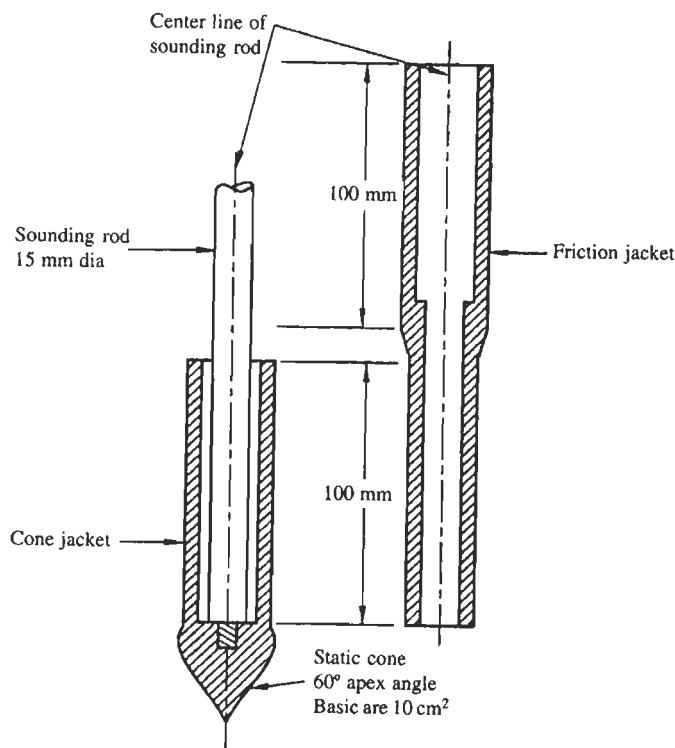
Static Cone Penetration Equipment and Cone Assembly
